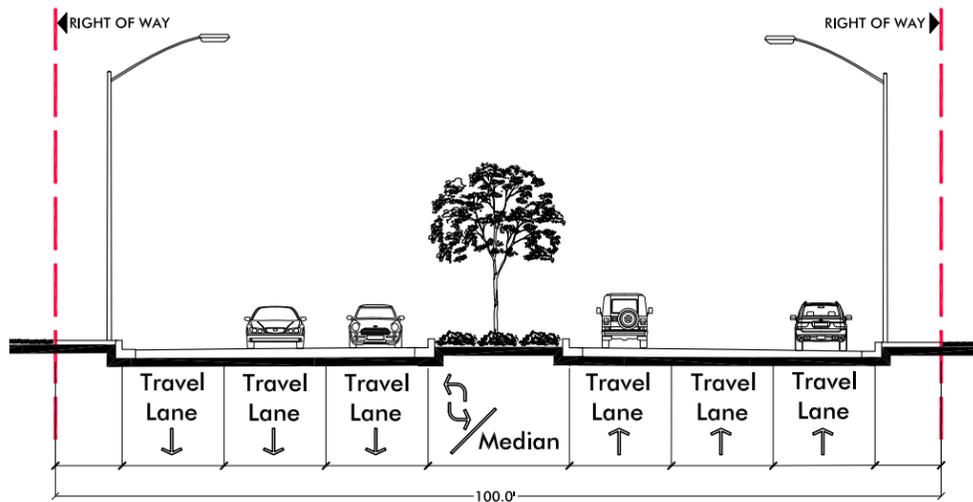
EDINGER AVENUE EXISTING STREET DESIGN
